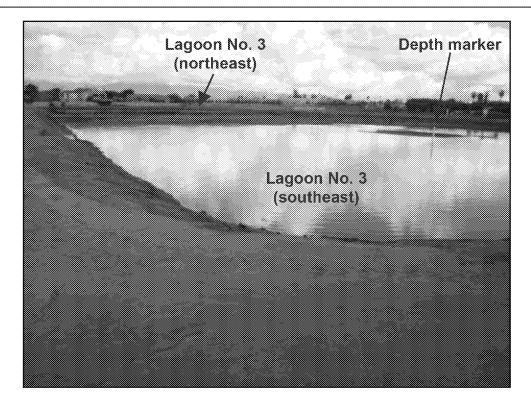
View facing north from the southern Facility perimeter of lagoon Nos. 2 and 3. Note the lagoons were divided into four (4) separate lagoons by an east/west earthen berm.
